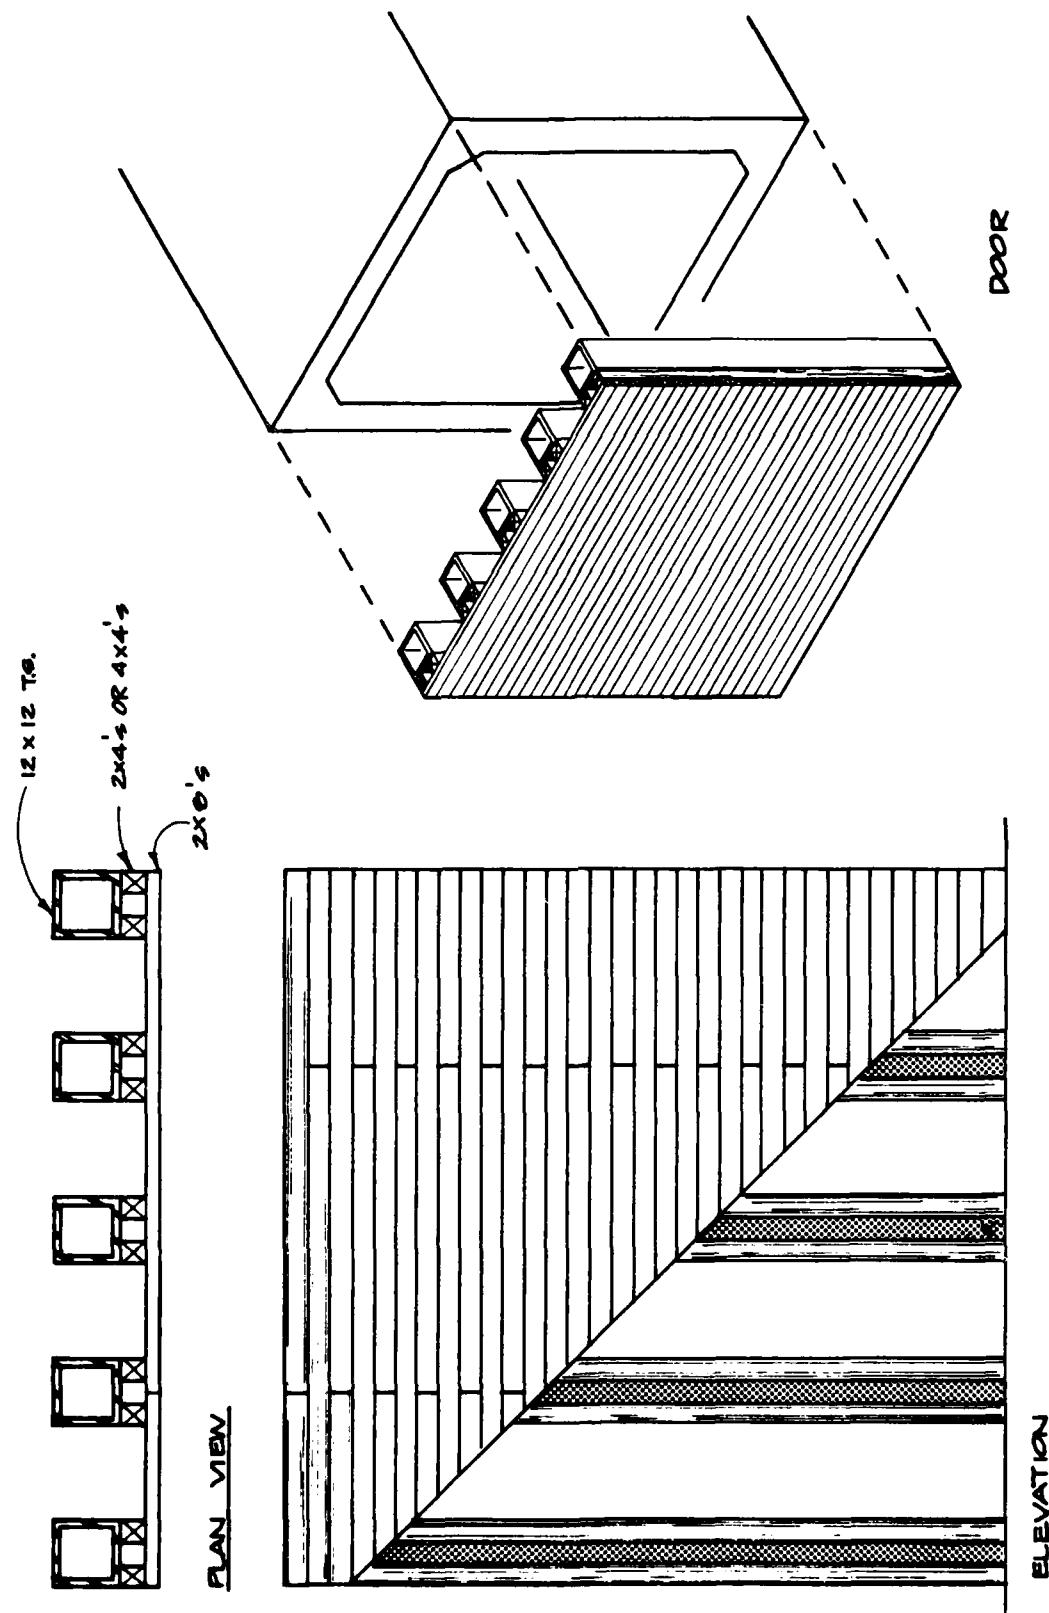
Typical Closure for a 10 ft by 10 ft Box Culvert For 40 psi.
